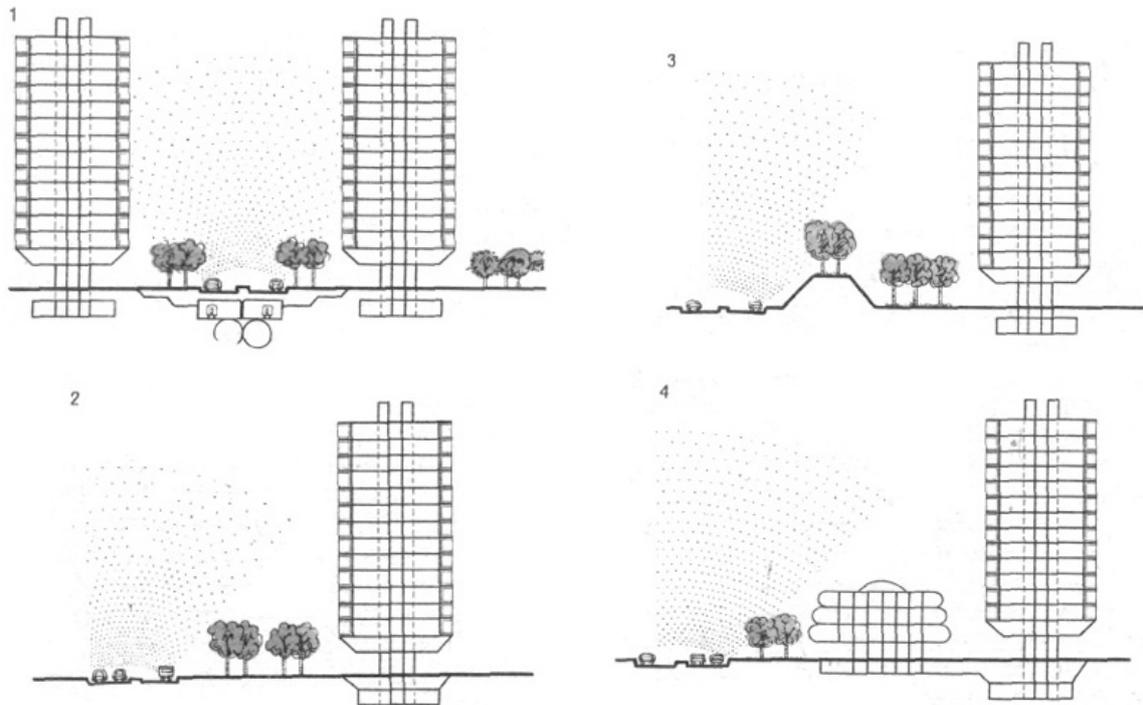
Development and transport noise: 1 — closed ordinary buildings along the street; 2 — protective strip of trees between the highway and buildings; 3 — protective walls and landscaping; 4 — placement in front of buildings of buildings of public institutions
